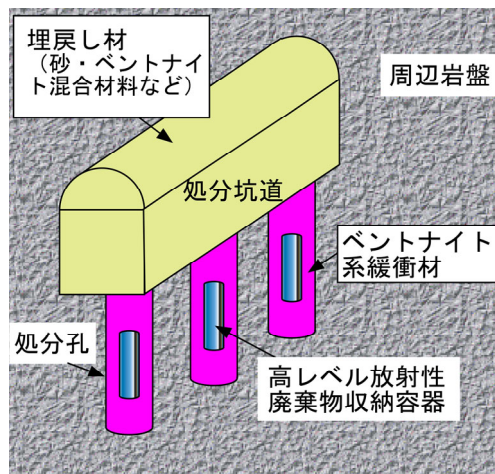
Schematic drawings of geological disposal facility and access tunnel
